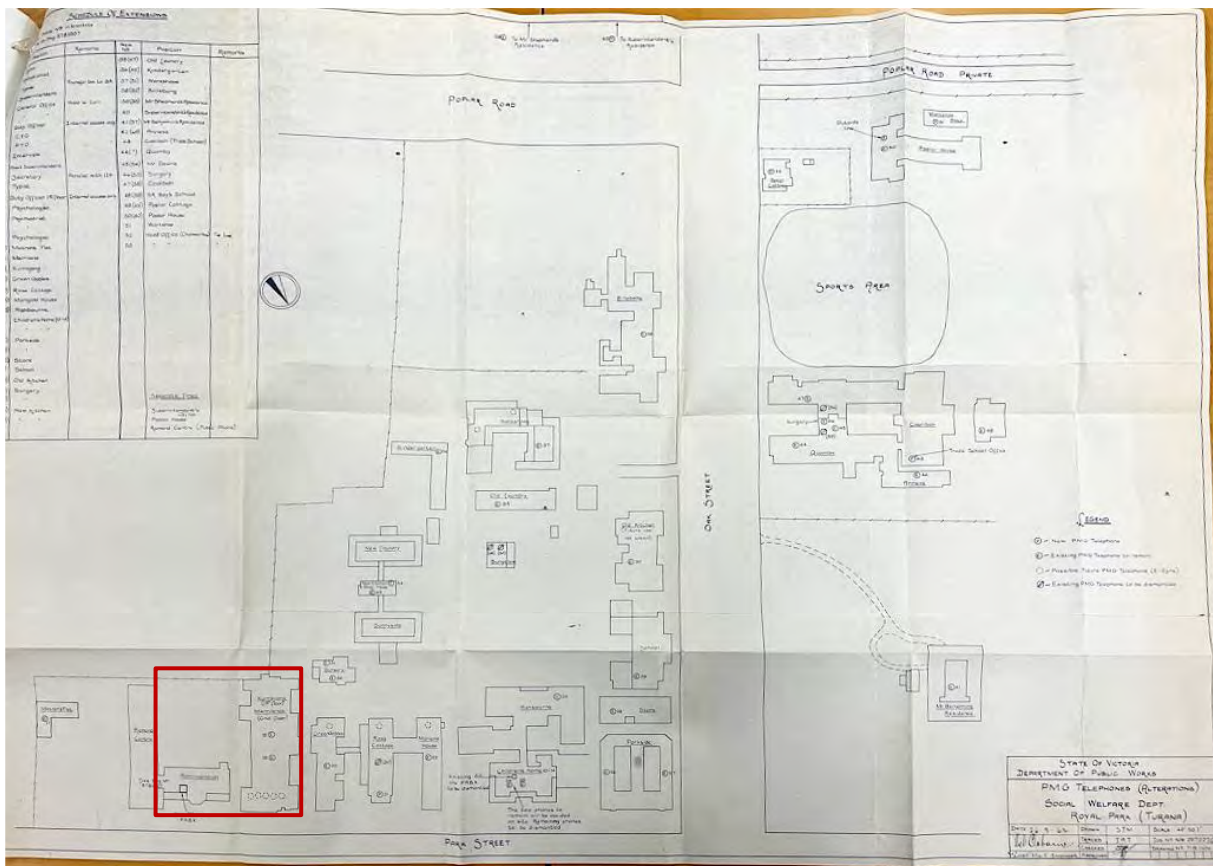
Plan from 1962 showing the extant interwar buildings (outlined in red) and other facilities. Only the two interwar buildings in Park Street are confirmed to survive. (Source: VPRS 06039 R-0001, with GML overlay)
